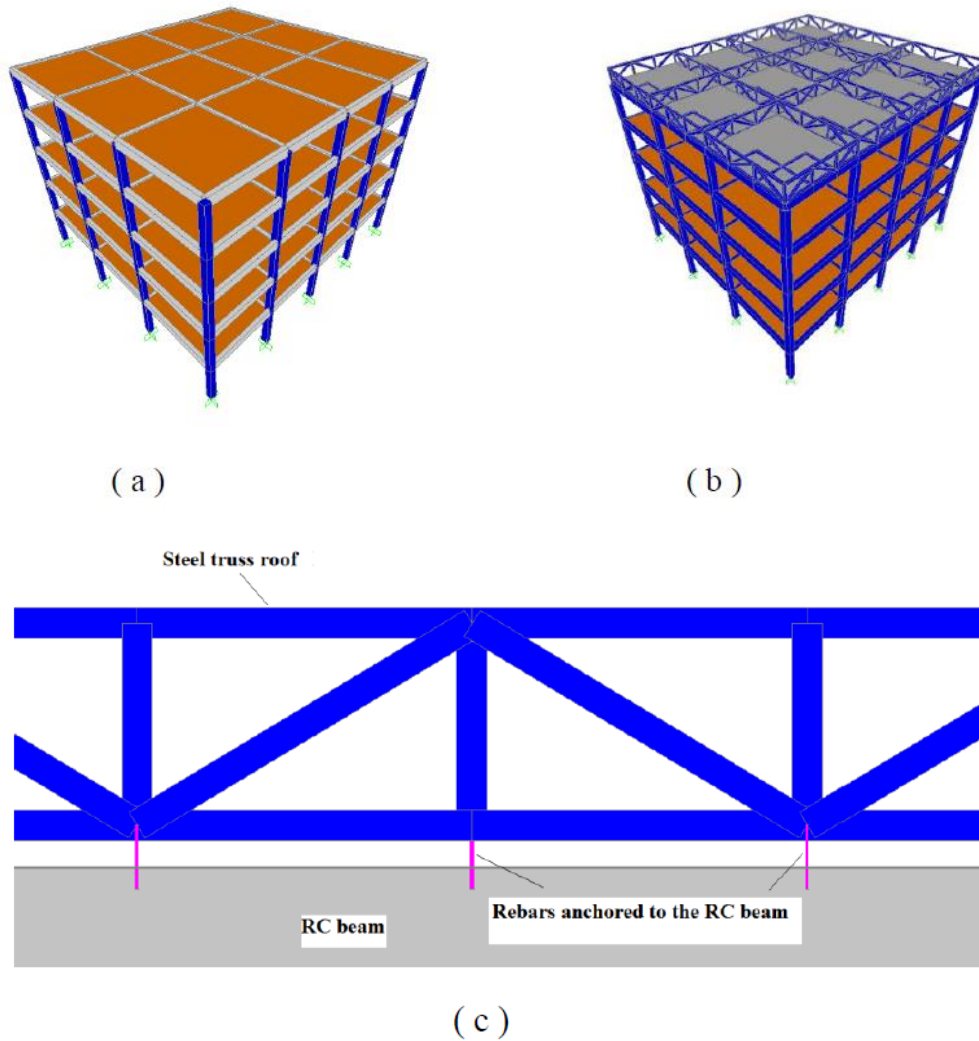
a) FEM Model, b) Model with TMD Steel Roof, c) Roof-building Connection Details
